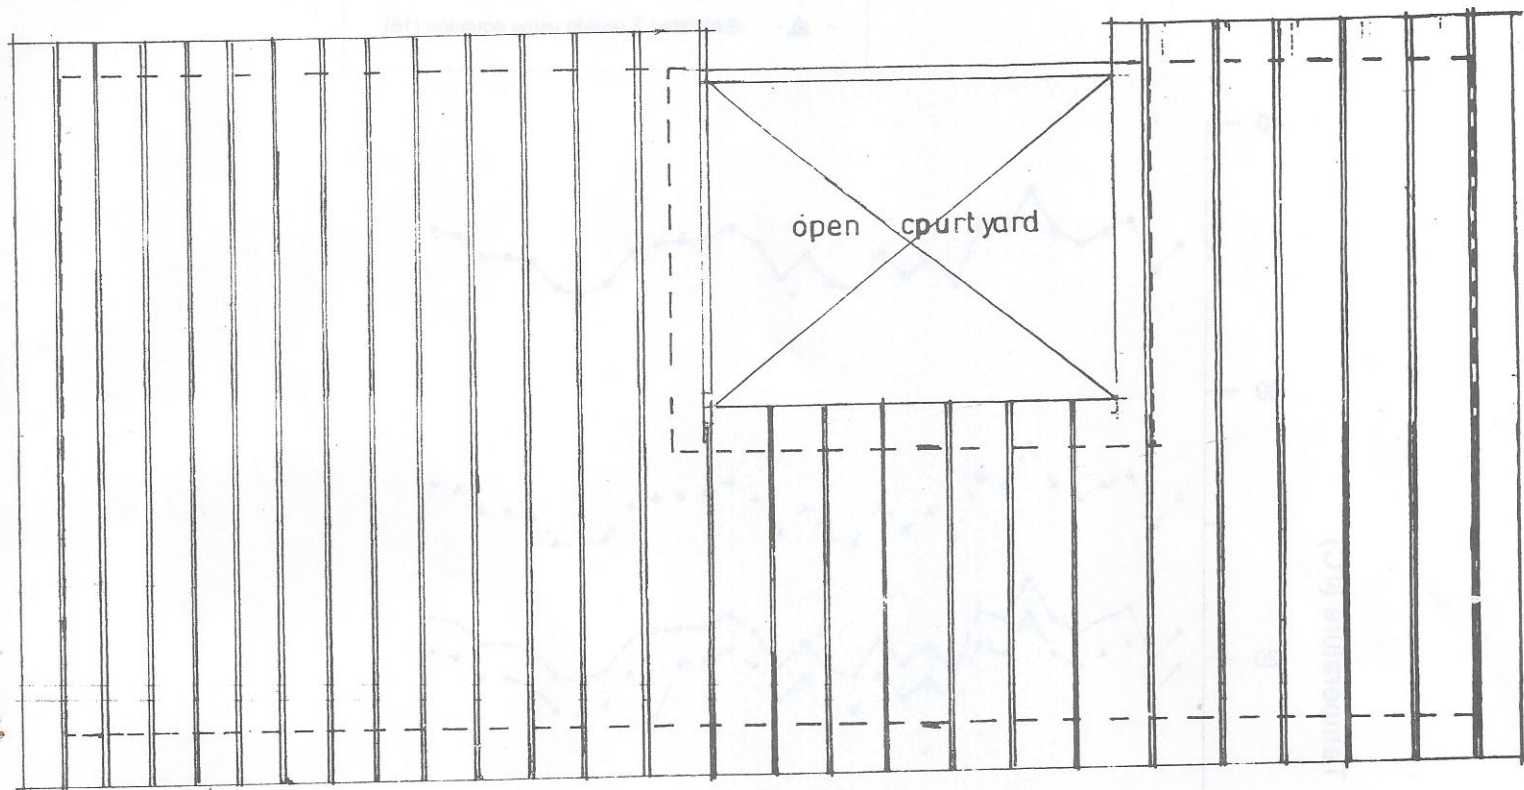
Roof plan of NBRI model house in Kano [with a flat roof option]
